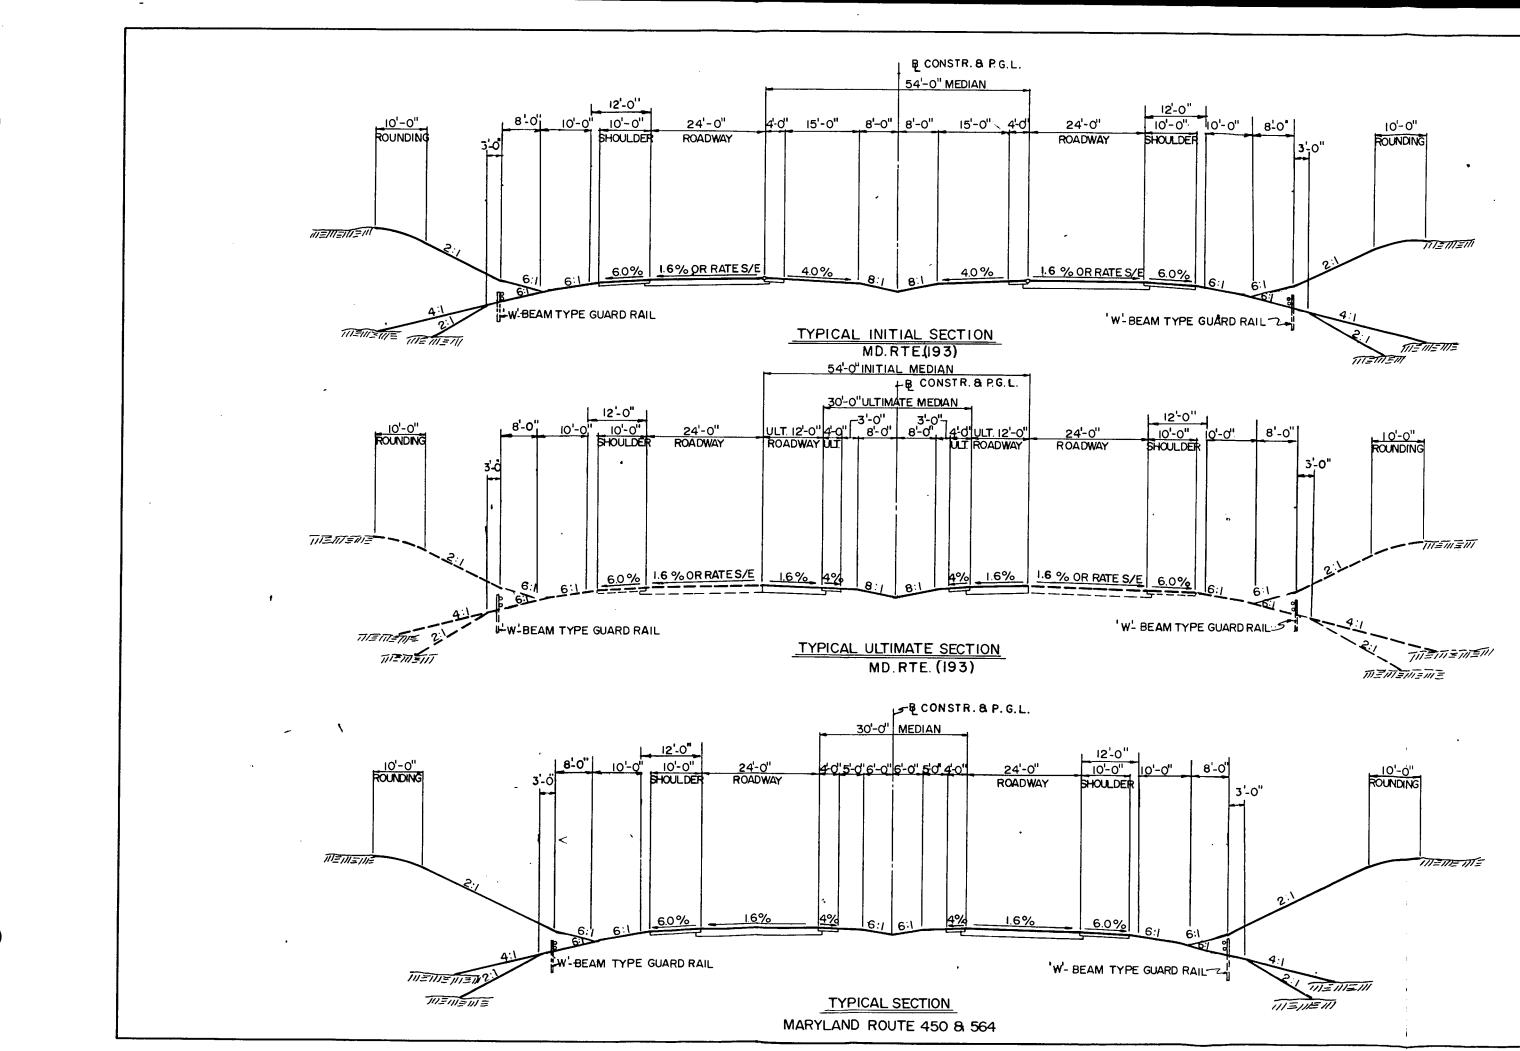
shows the proposed typical section of two 24 foot roadways with 10 foot outside shoulders and 4 foot inside shoulders, separated by a 54 foot median. The addition of the 2 ultimate lanes will take place in the median area, thus providing ultimately for two 36 foot roadways divided by a 30 foot median.
